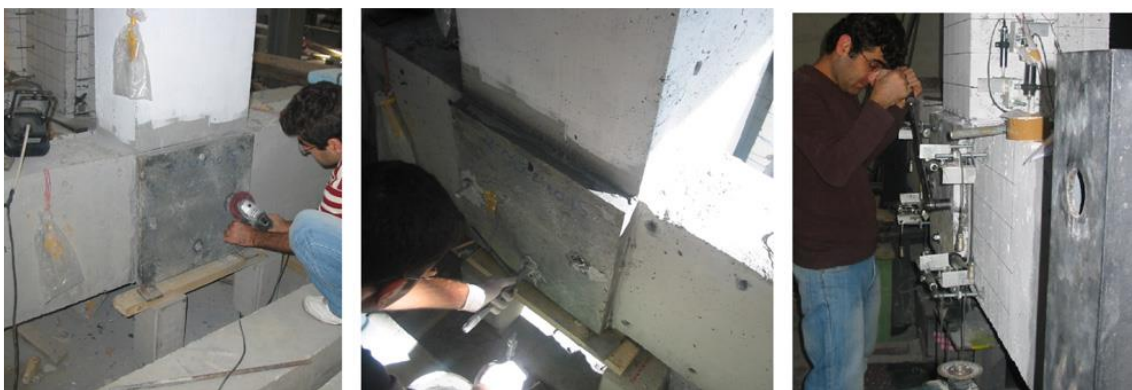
Retrofitting process (horizontal member is the column and the vertical member is the beam)
